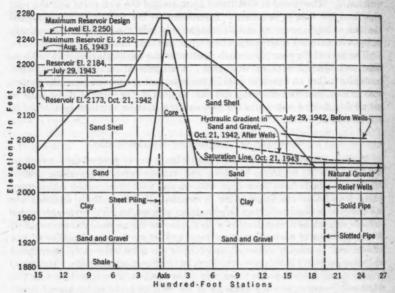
Relief-Well Installation, Fort Peck Dam in Montana
